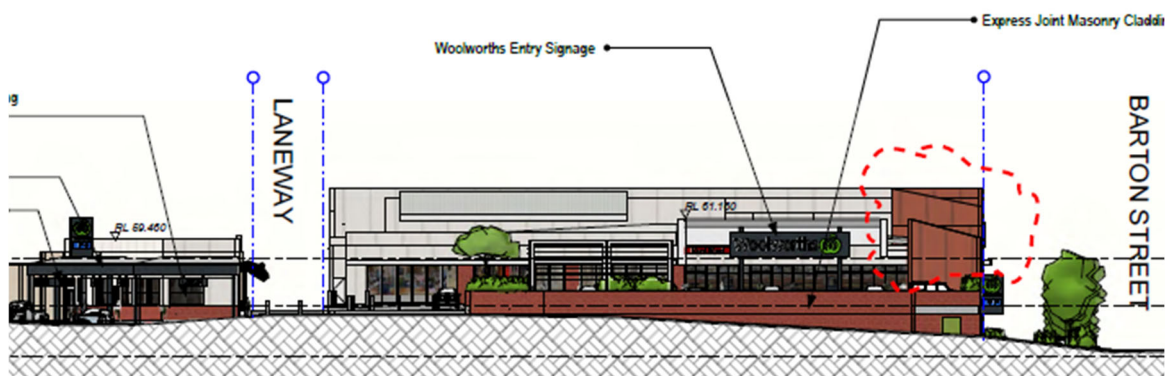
Unnamed Laneway preferred location for public art installation labelled “Public Art wall to laneway” to replace existing view from Kurri Kurri Hotel car park.
